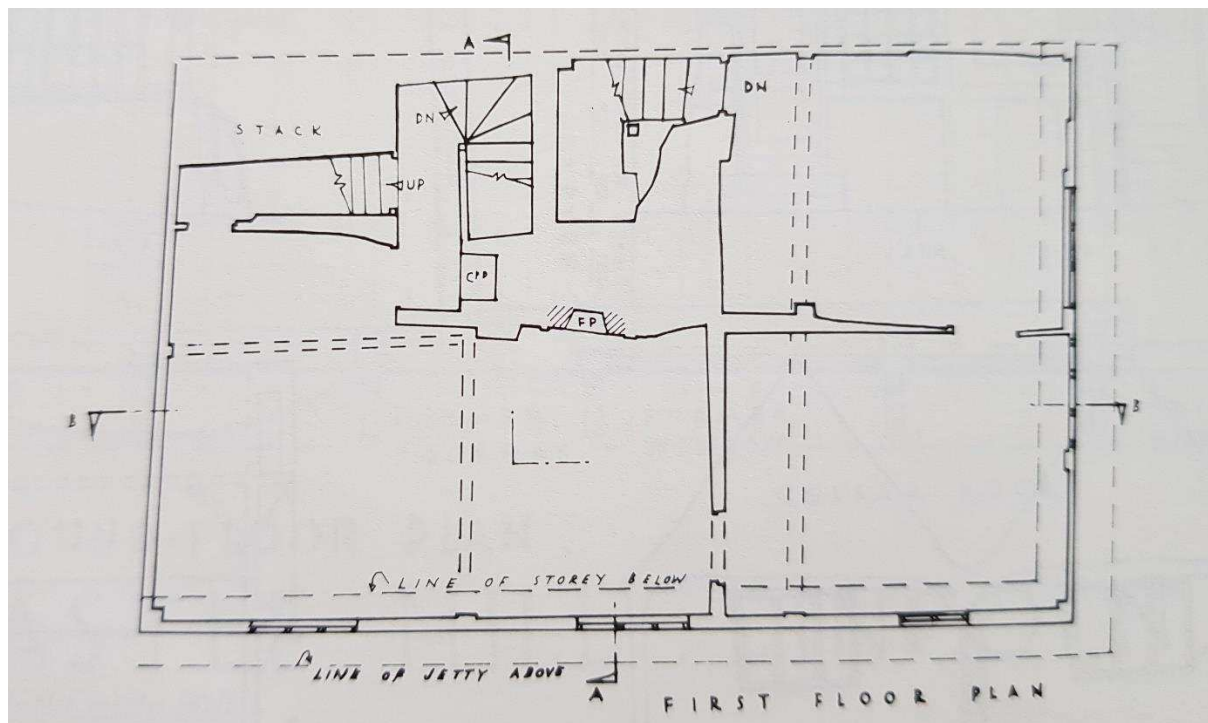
First floor plan based on a survey from February 1957.⁶⁴
